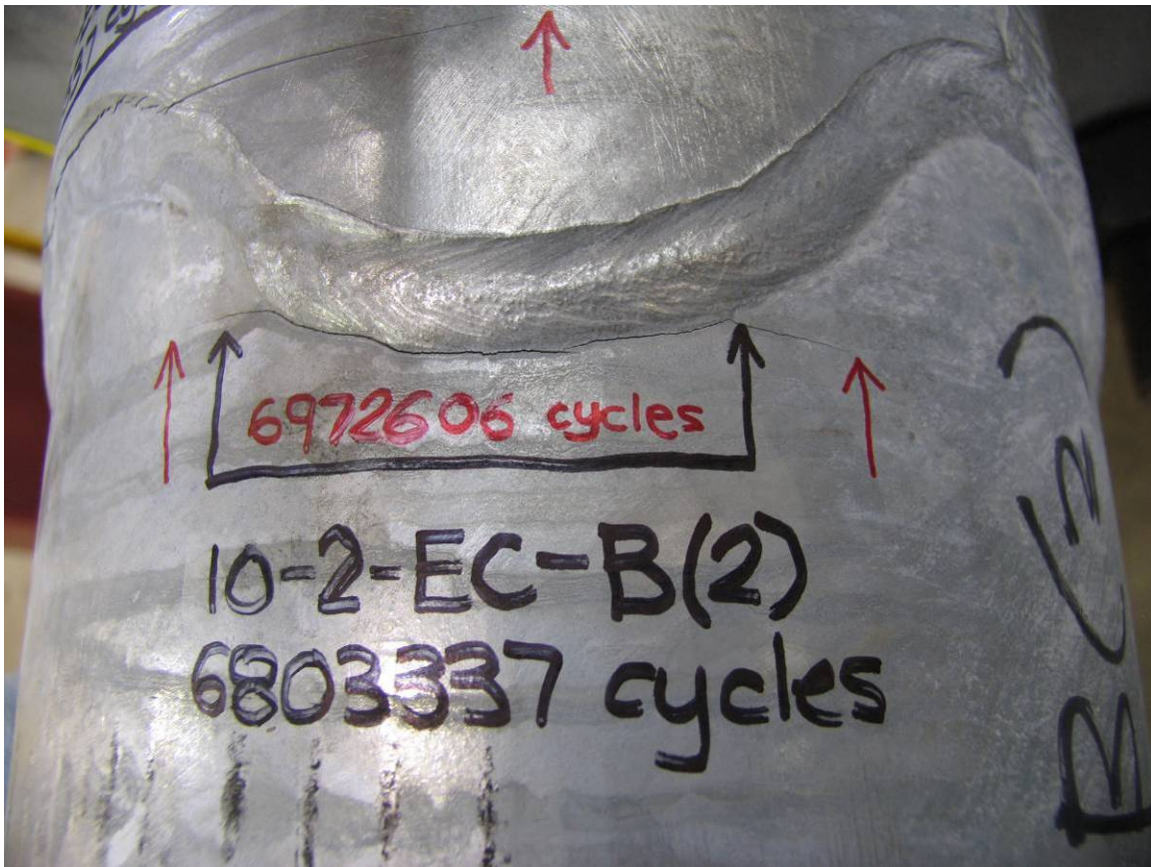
Fatigue Crack at External Collar Maximum Dimension
